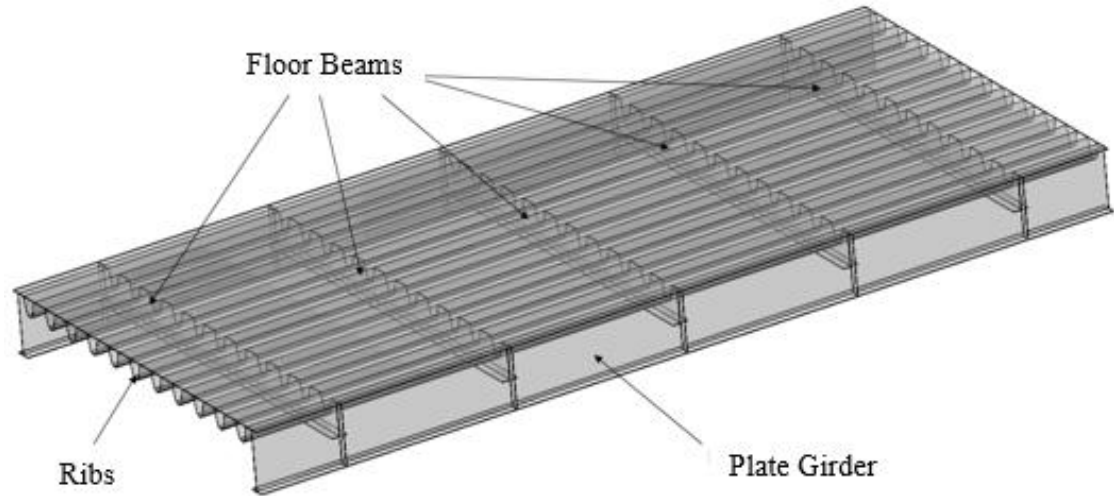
Illustration. Overview of the plate girder model. Shown are the edge plate girders, ribs, floor beams and deck plate.
